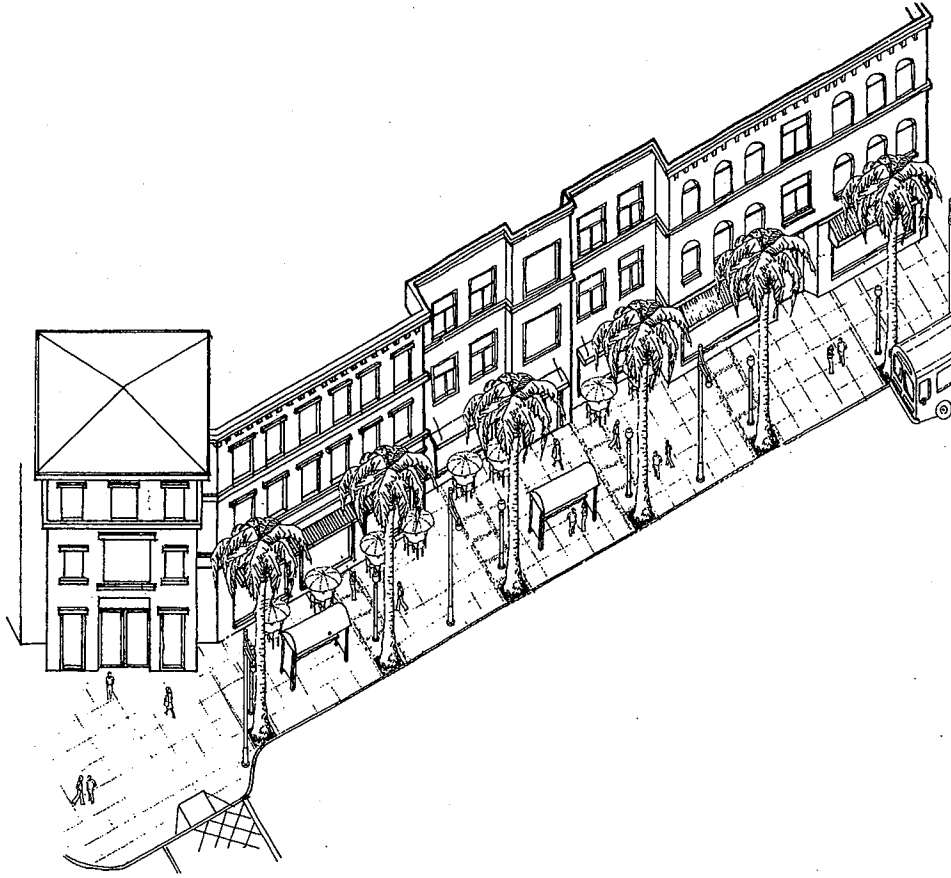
Concept for Mare Island Way Streetscape along Vallejo Station between Georgia Street and entry to Ferry Parking
